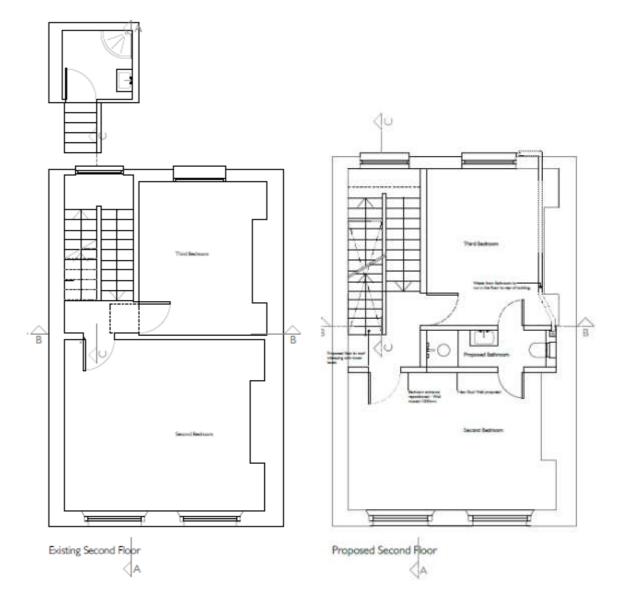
The existing (left) and proposed (right) second floor plan of 5 Sharpleshall Street (2013/7037/P and 2013/7086/L). The consented scheme included the insertion of a bathroom between with front and rear rooms. The bathroom is against the chimney breast of the front room.
